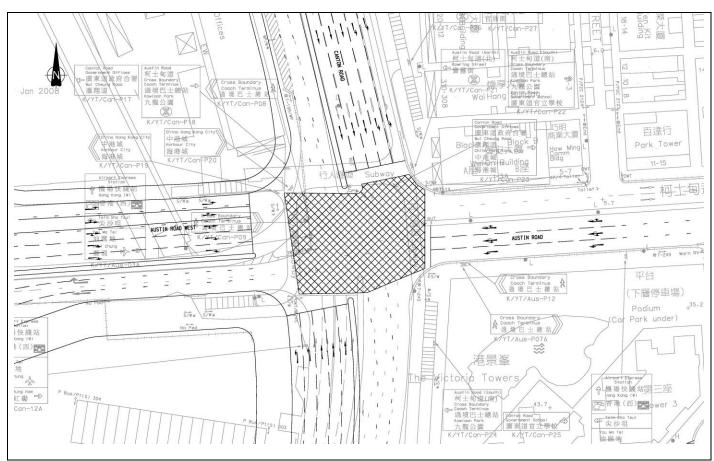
Planned Junction Layout of Canton Road/Austin Road West without Underpass (J18A)
